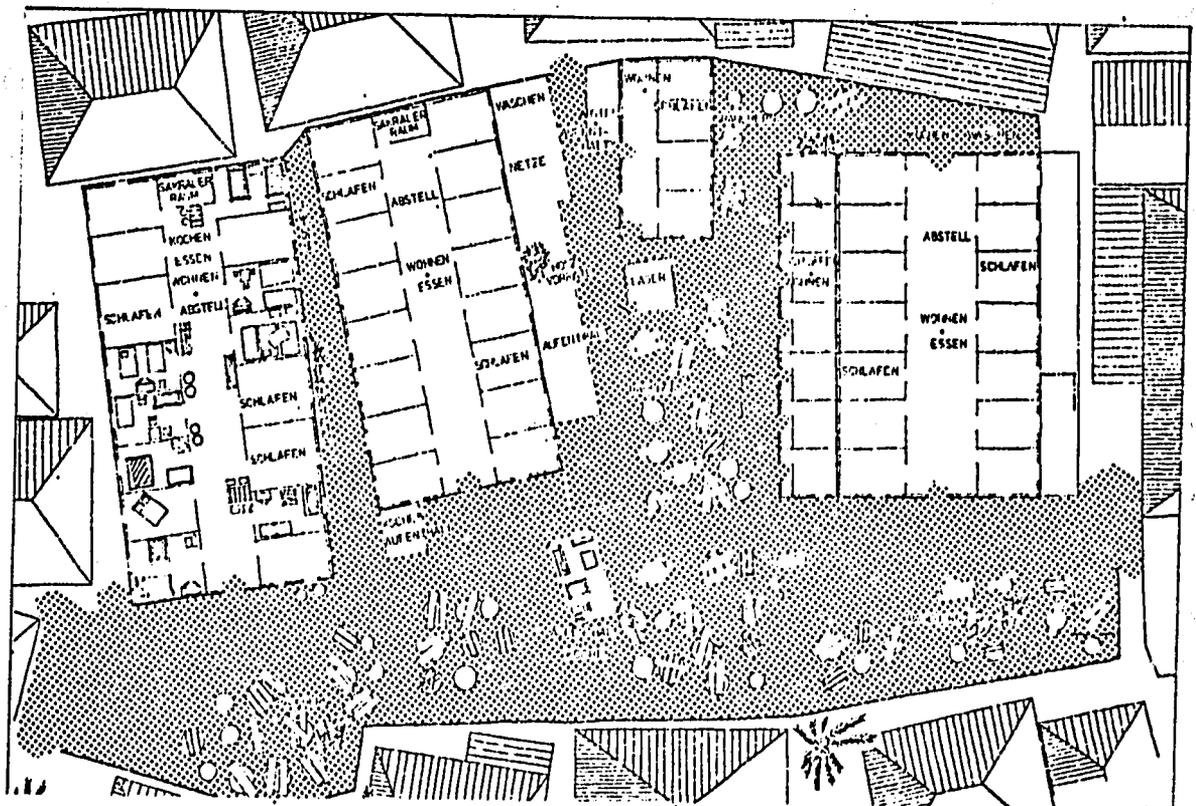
West Point. Plan of Fanti fishermen's compound showing grouping of long houses in a yard used by the women to prepare fish which their men have caught.
